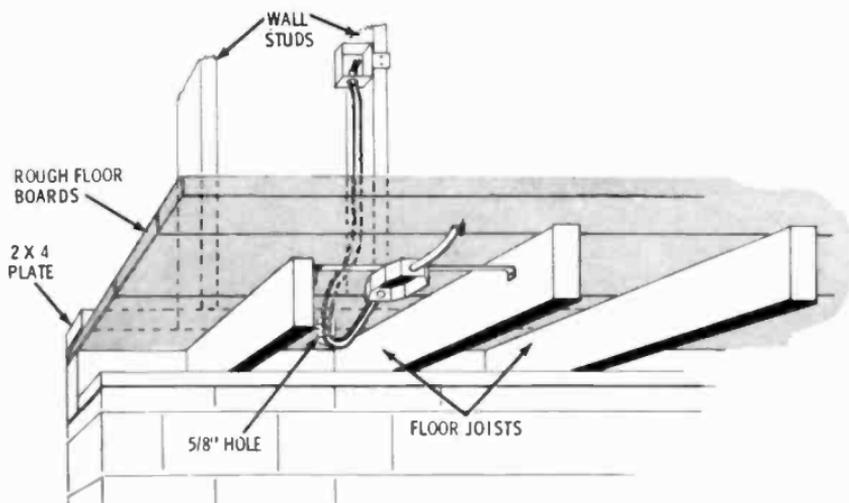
To feed cable to a new outlet from the basement, drill a $\frac{5}{8}$ -inch hole through the "plate"; this is the 2×4 put down on the ends of the floor joists when the house was built, and on which the wall studs were nailed.
